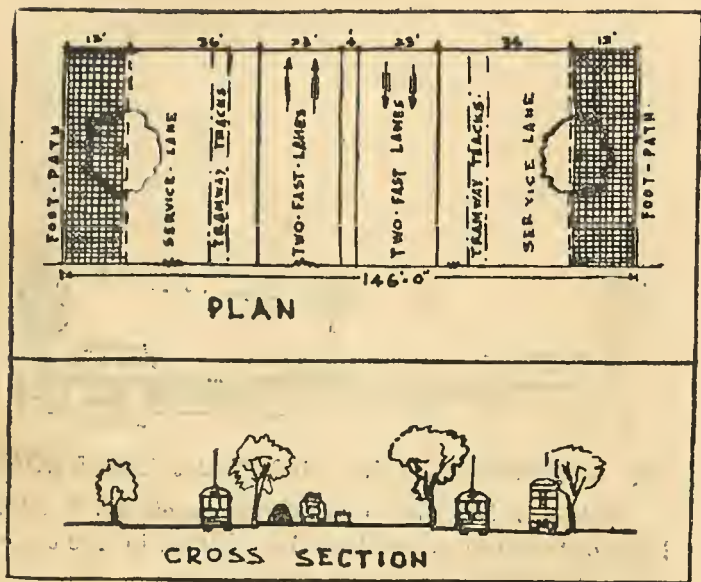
TYPE DESIGN FOR 146 FT. ARTERIAL ROAD CARRYING TRAMLINES PROPOSED IN GREATER BOMBAY MASTER-PLAN
